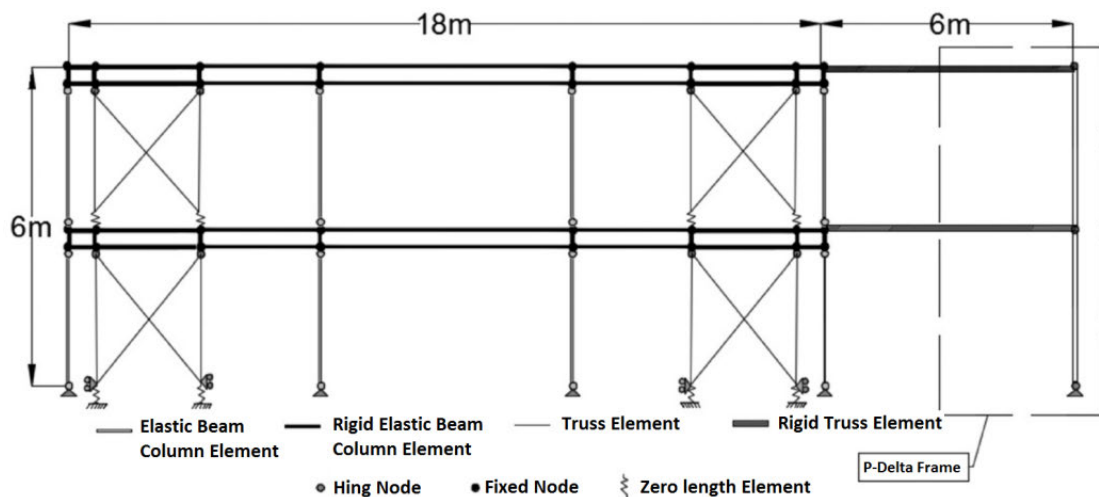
2D Schematic of a braced bay in residential building [177]
